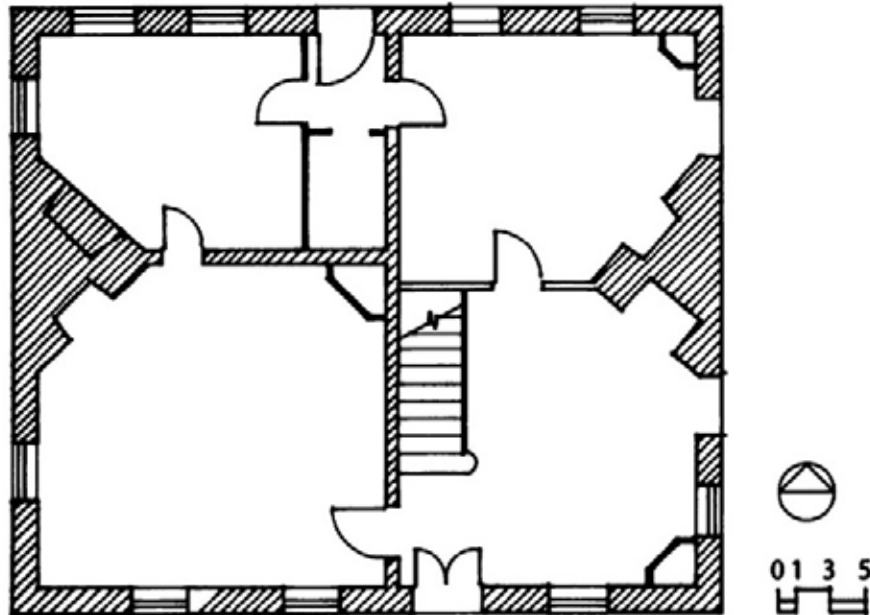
Great House Floor Plan. Paul Touart, Anthony O. James. "At The Head of The Bay" by Pamela Blumgart.
